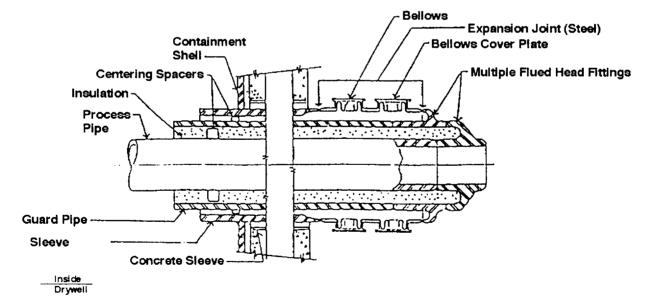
Typical Piping Penetration with Bellows - Steel Containment.
